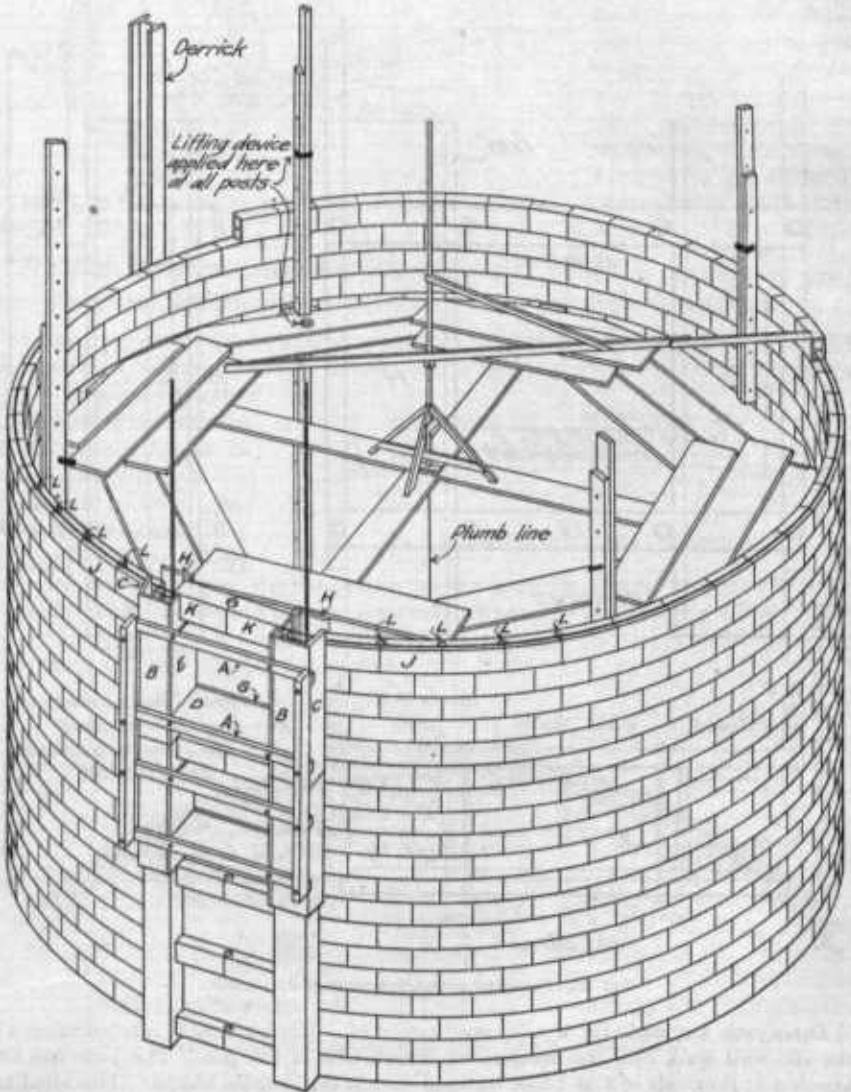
Form, scaffold, and guide used in building silo wall and doorway.
